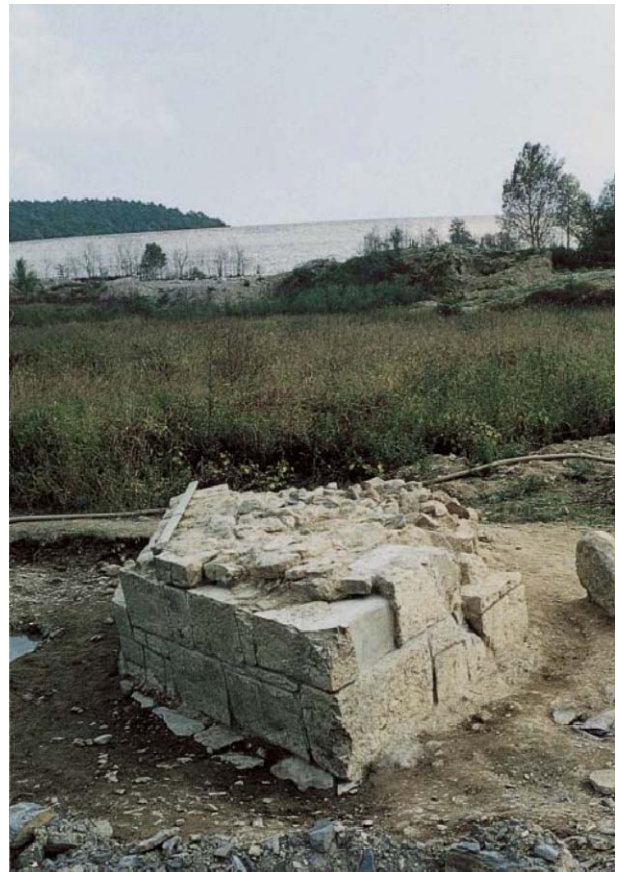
Colombaiotto bridge. *The probable pier VII seen from upstream.
